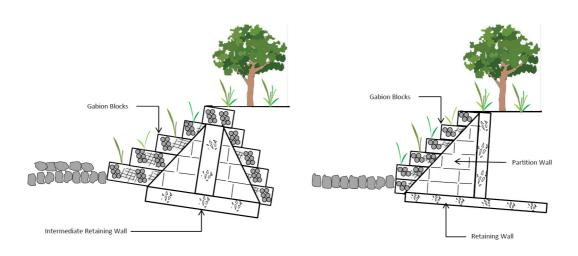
COMPOSITE STRUCTURE OF CONCRETE RETAINING WALL WITH GABION LINING
